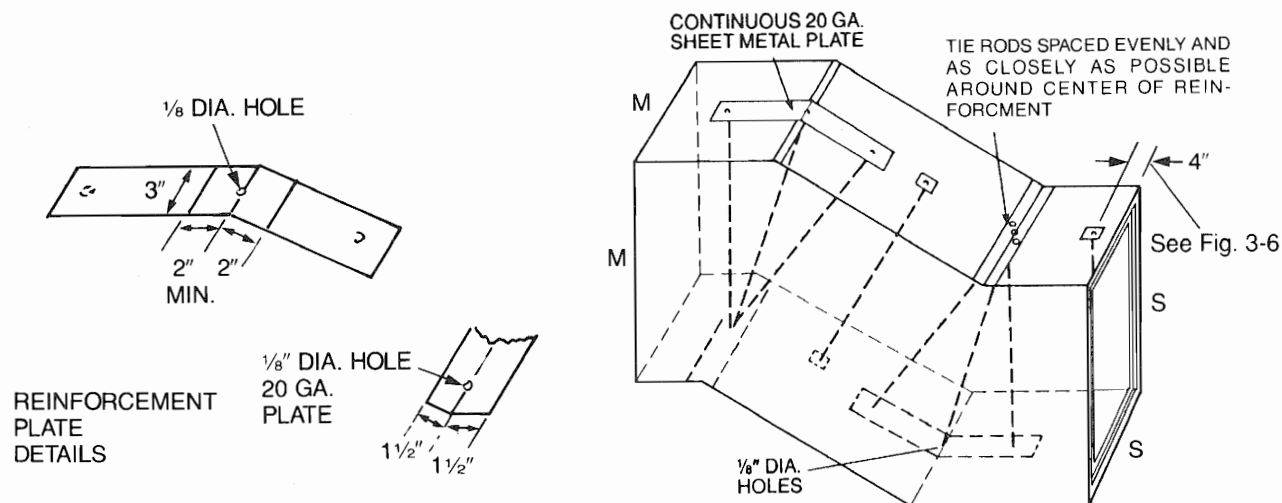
MITER REINFORCEMENT WITH INTERMEDIATE TIE RODS AND EXTENDED SHEET METAL PLATES
